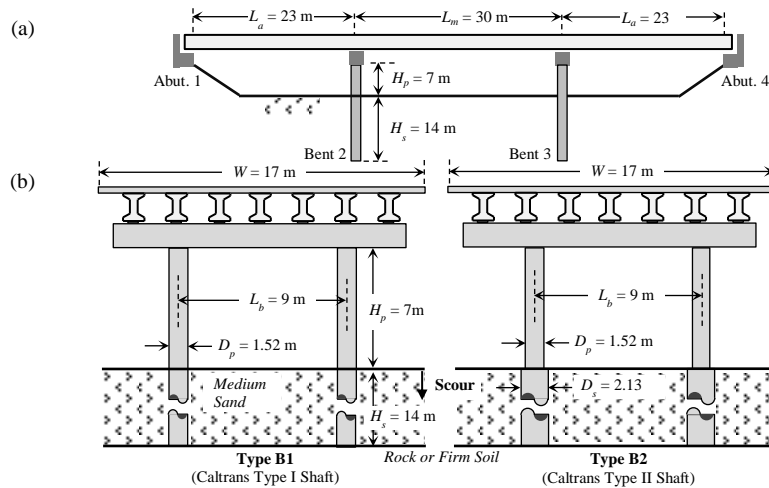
Schematic views of Type B bridges; (a) elevation view, (b) substructures
